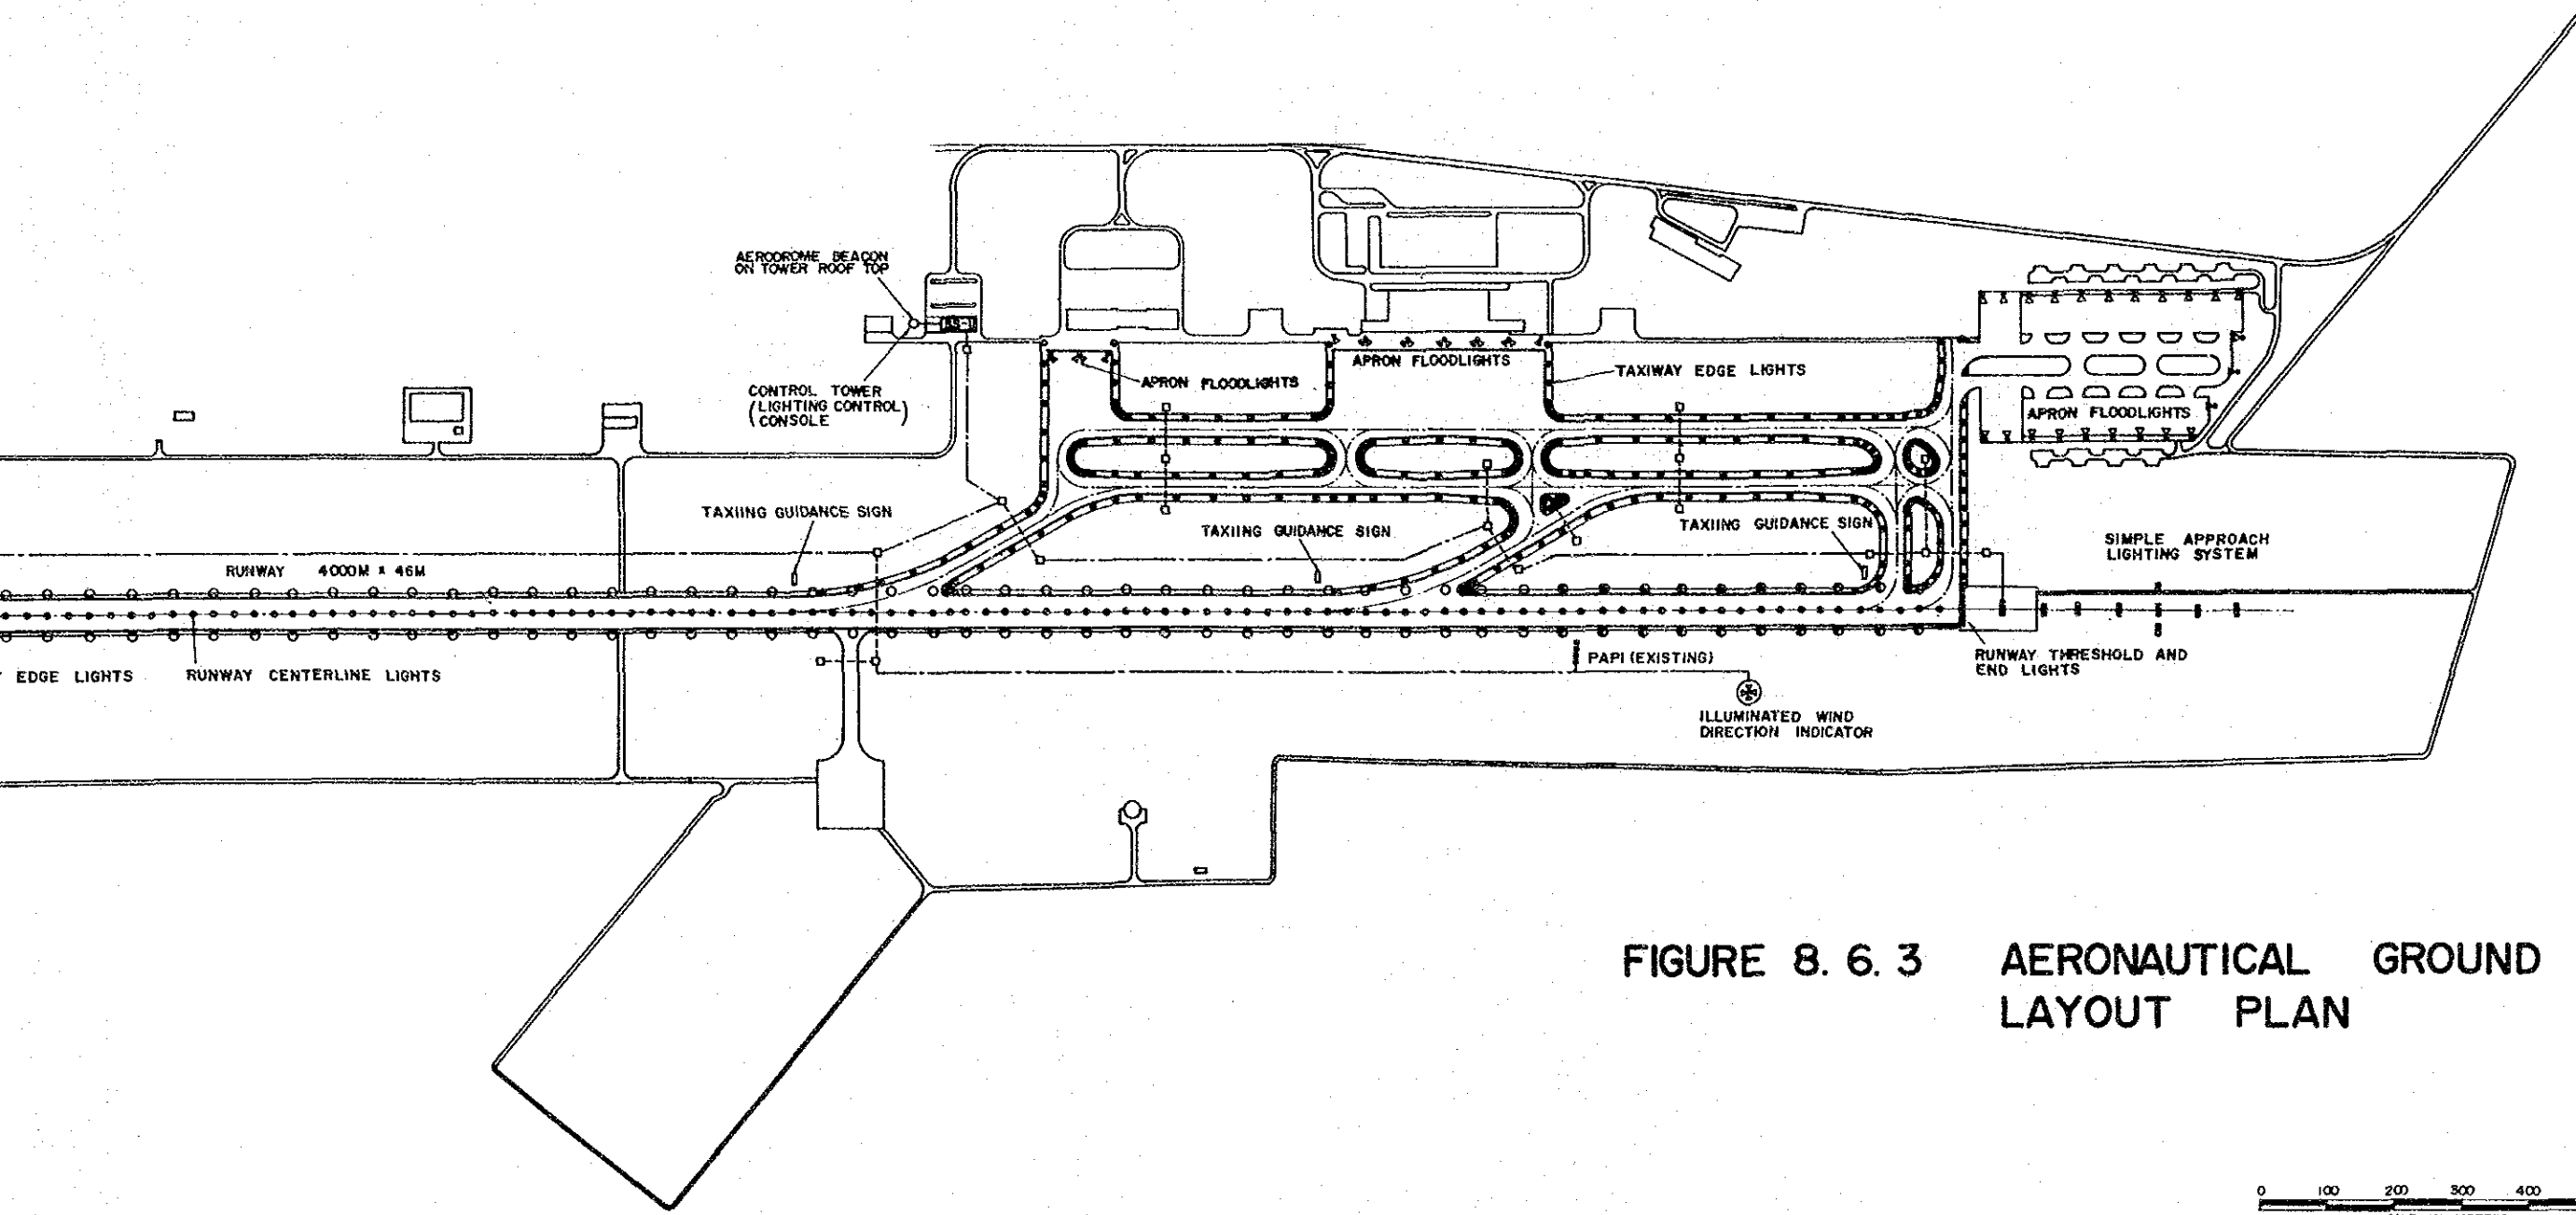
6. 3 AERONAUTICAL GROUND LIGHTS LAYOUT PLAN
